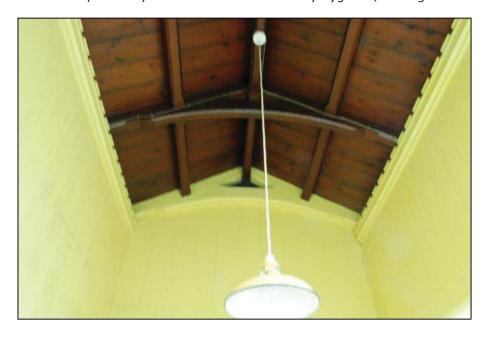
(shot 98): View of the timber roof in the entranceway, looking southwest
